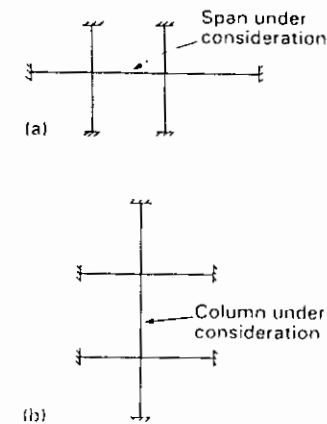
Subframes for use in multistorey frame design: (a) beam design sub-frame; (b) column design subframe.
